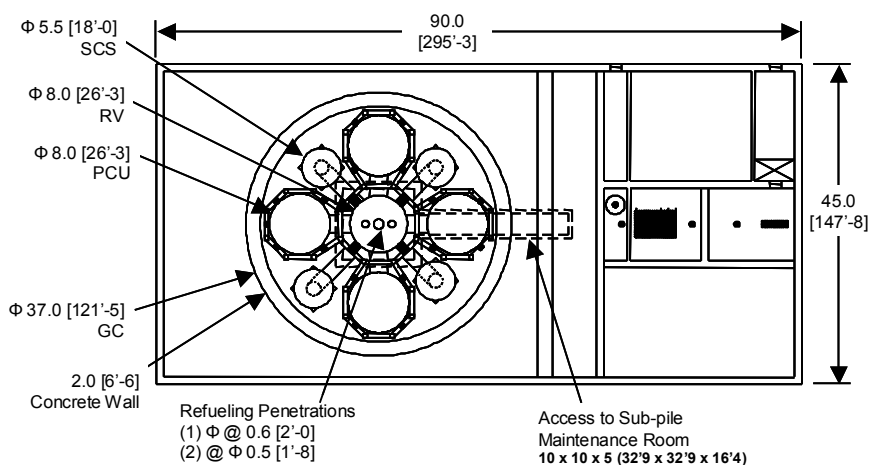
2400 MW<sub>t</sub> GFR guard containment layout – plan view.
